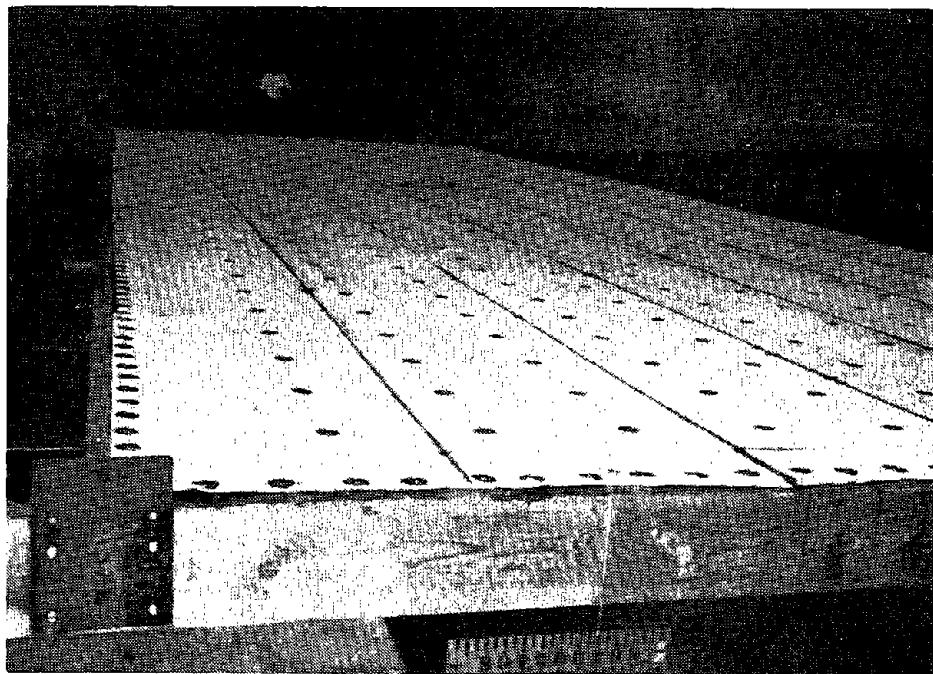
DIAPHRAGM I<sub>1</sub> SHOWING RENAILING OF ROOFING.
